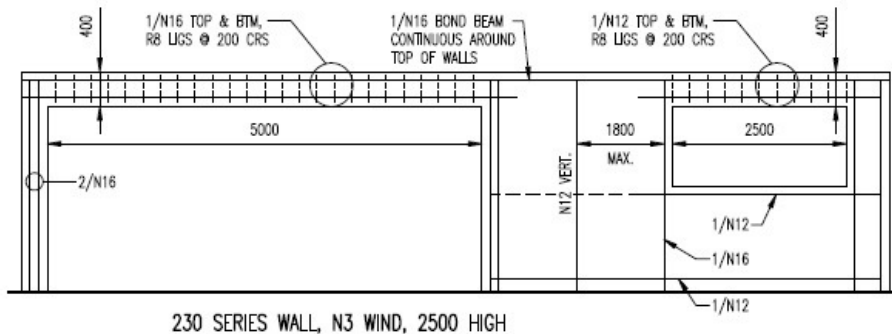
2500 High Wall, N3 Wind Rating, 230 Series ECO-Block (Max. roof load width: 6.6m)
